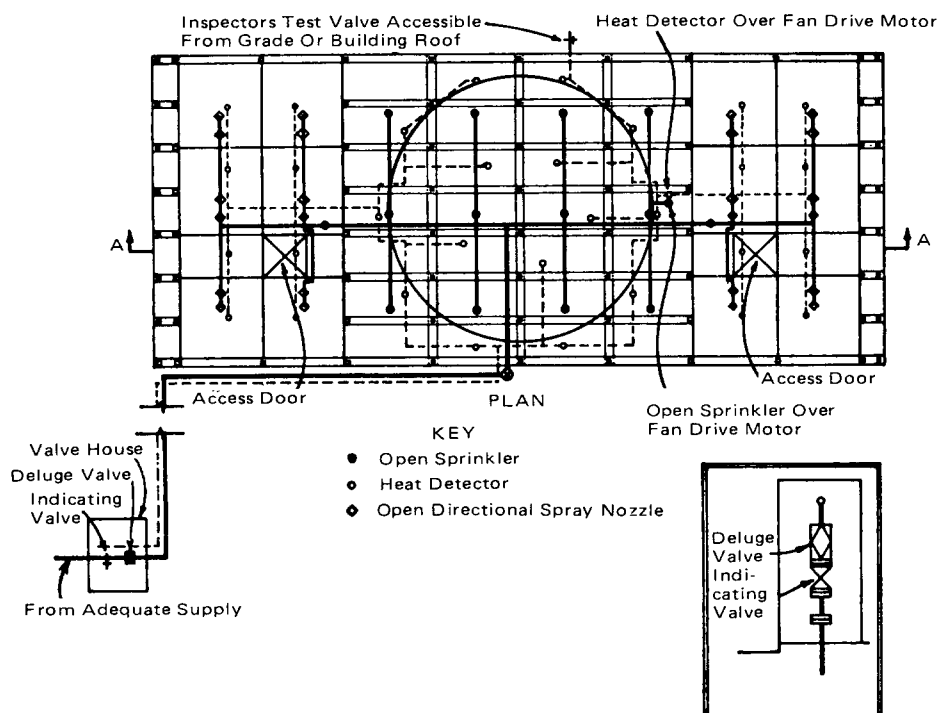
(a) Typical deluge fire protection arrangement for crossflow towers with completely enclosed distribution basins.
